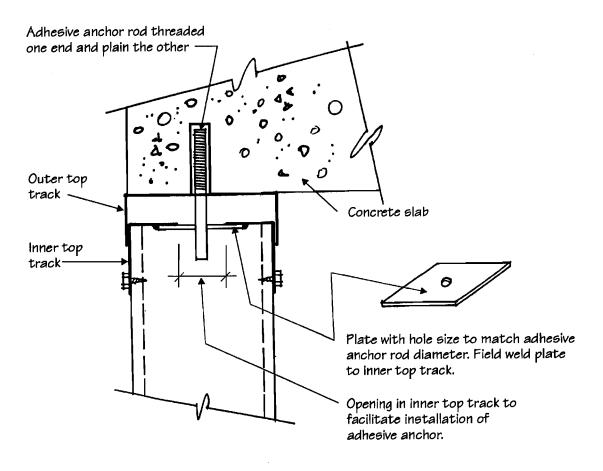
19 OUTER TOP TRACK ADHESIVE ANCHOR RETROFIT DETAIL
